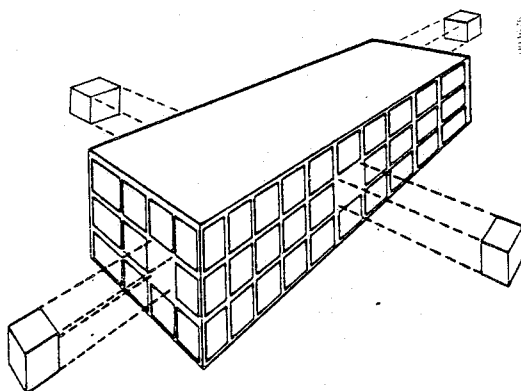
Building configuration with office modules oriented to West, South, East, and North.
